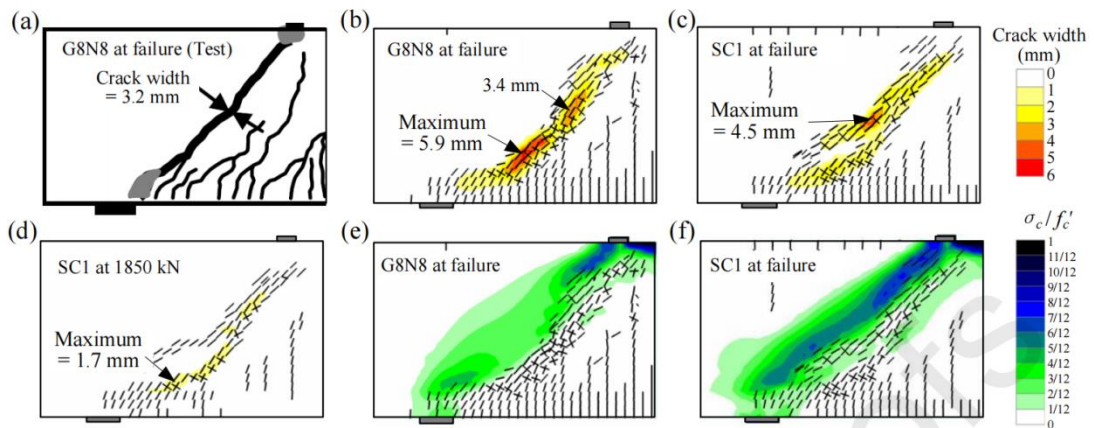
Crack Width of G8N8 And SC1 Under Loading 1850kN(Chen et al, 2019)
